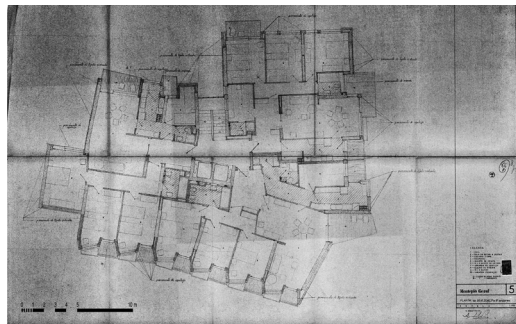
Montepio Geral building plan, 3–8 floor (CMPorto & Ricca Gonçalves 1961).
